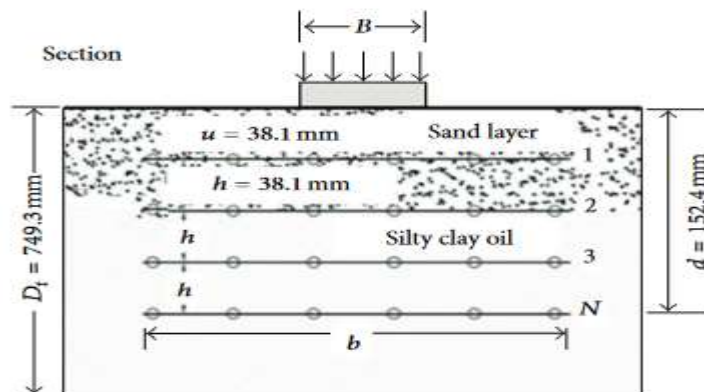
Layout of geogrid spacing in cross section of model tank and footing
